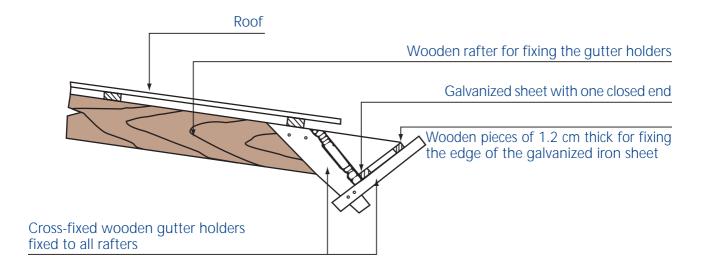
Fix the "V" shape galvanized iron sheet gutter to wooden structure using the wooden gutter holders.
